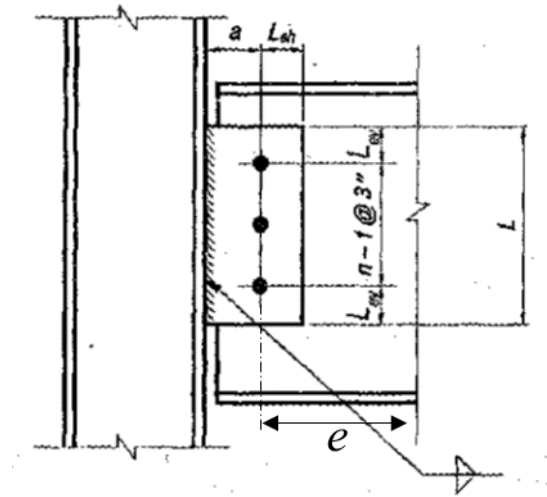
Conventional WSP connection (AISC steel construction Manual 2011)
